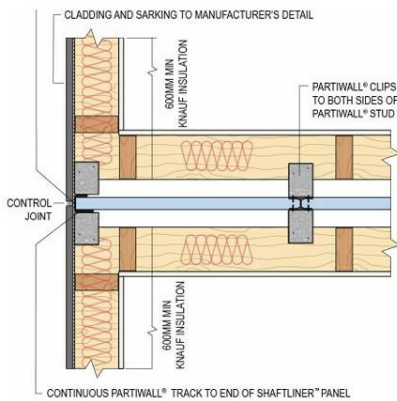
Clad Wall Junction with Thermal Break – Plan View
